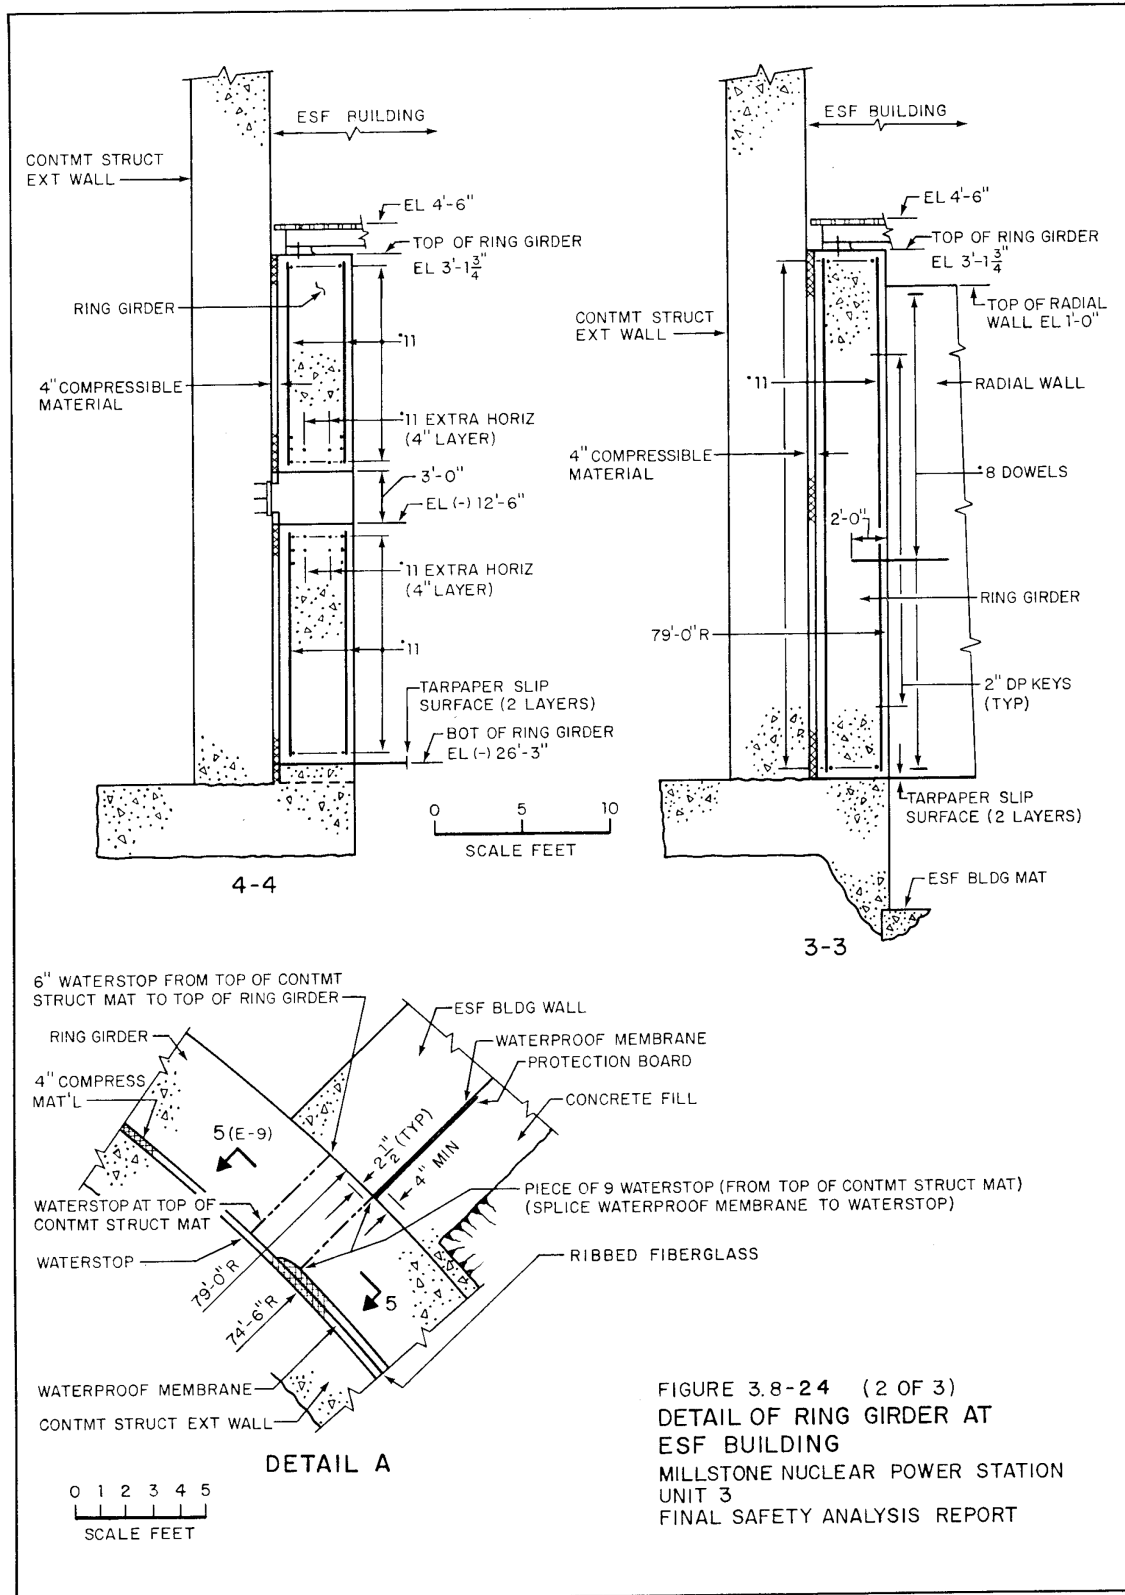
DETAIL OF RING GIRDER AT ESF BUILDING (SHEET 3 OF 3)
